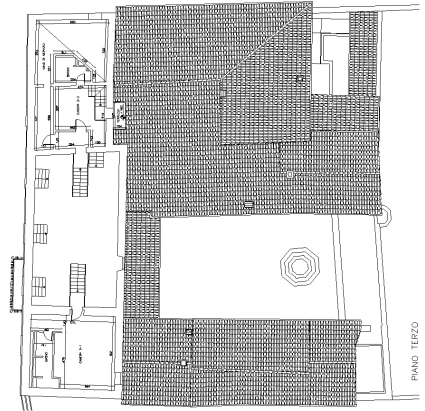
Plan of the fourth floor and lower roof of the Palazzo Spinola.
